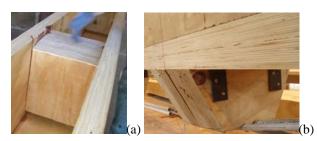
Beam detail view (a) internal deviator (b) external deviators
